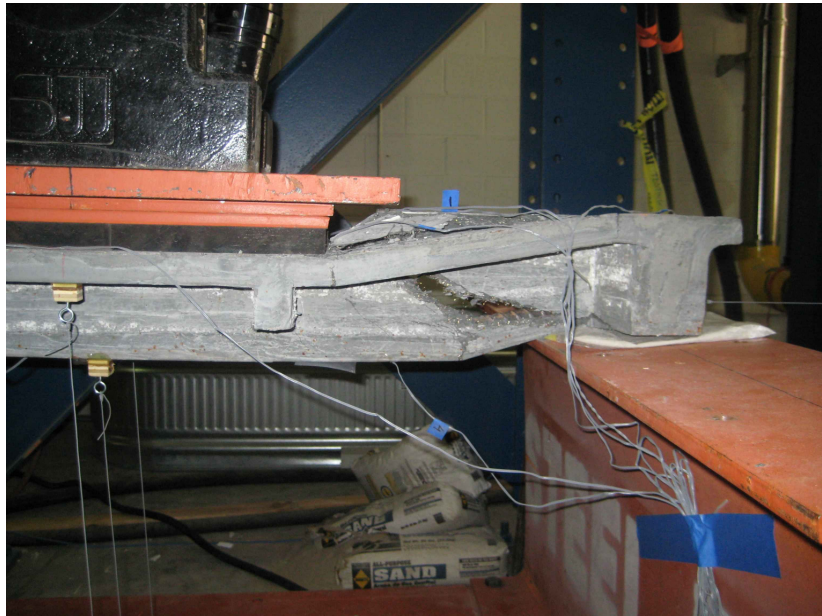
Shear-Bond Failure of Specimen 1T1S without End Anchorage
